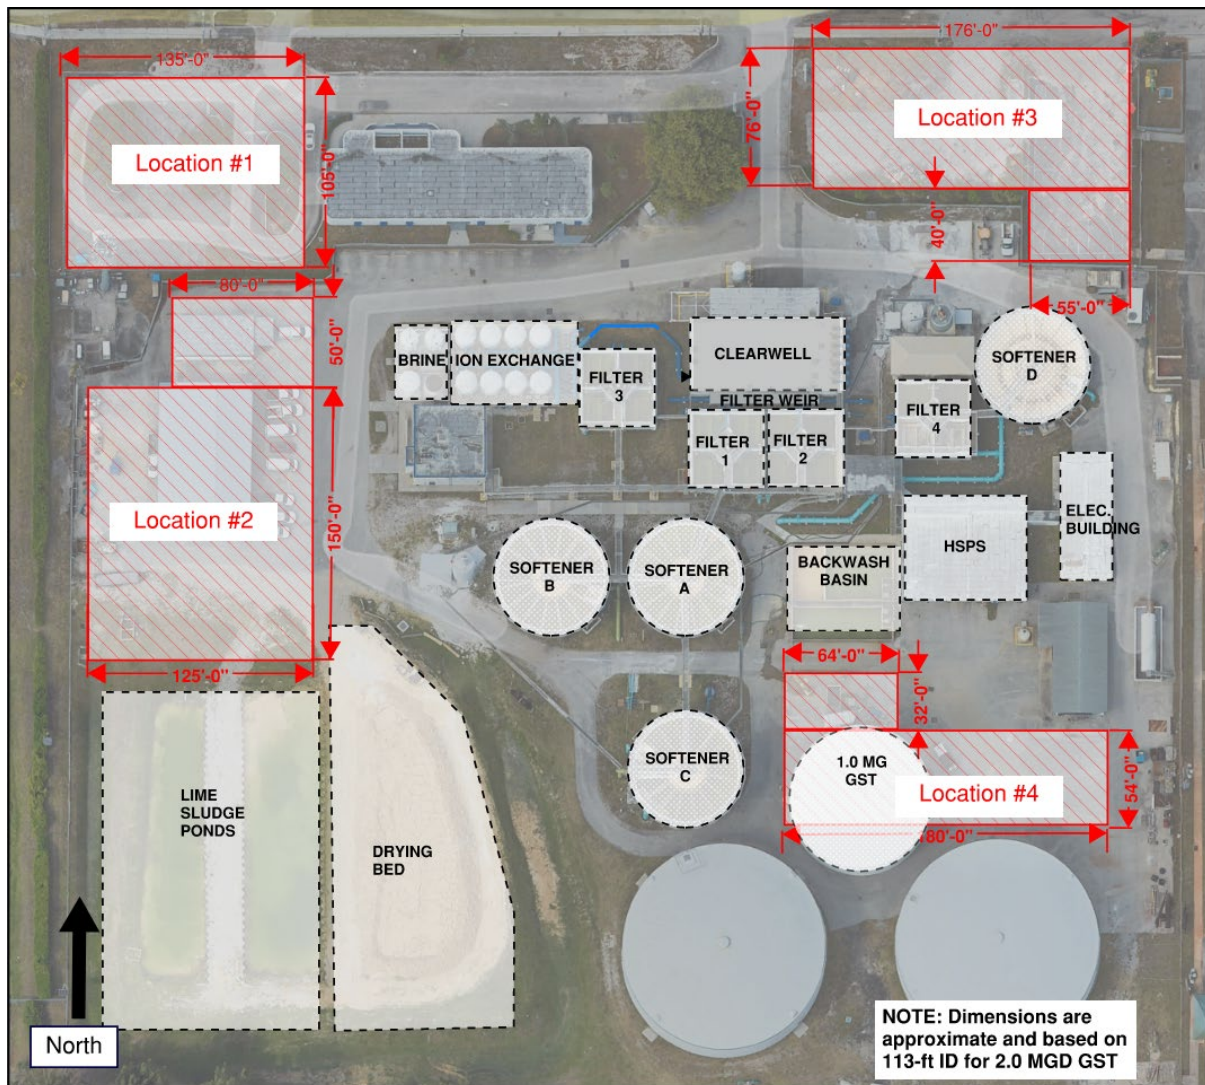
Potential Siting Options Within the WTP That Were Considered During Conceptual Design for the Proposed PFAS Treatment Facility
